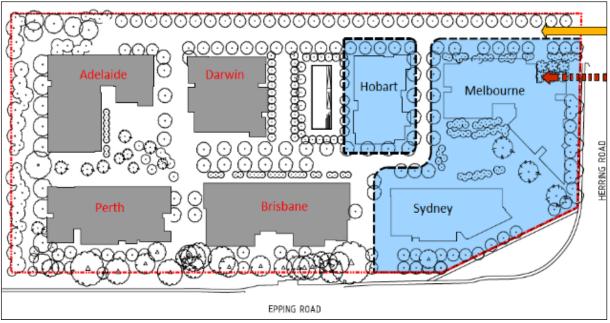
Approved Concept Plan layout and Stage 1 (Stage 2 outlined and shaded in blue) (Source: Proponent)
